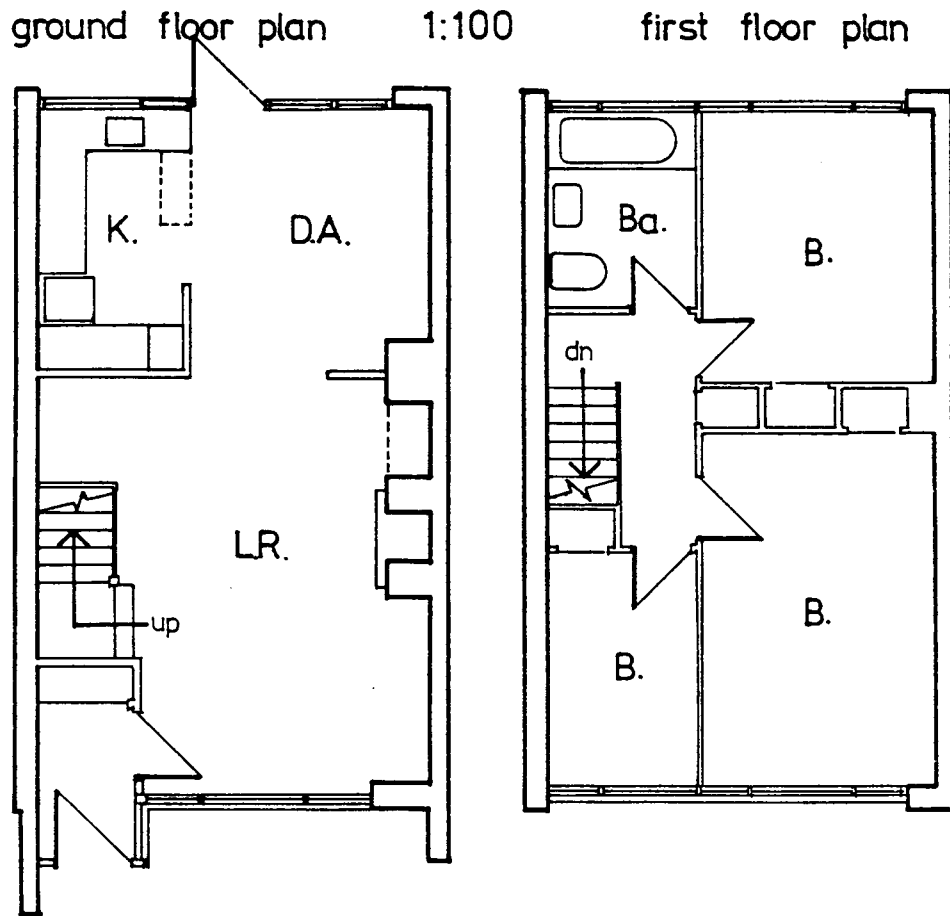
TWO STOREY TERRACE HOUSE 1966.
